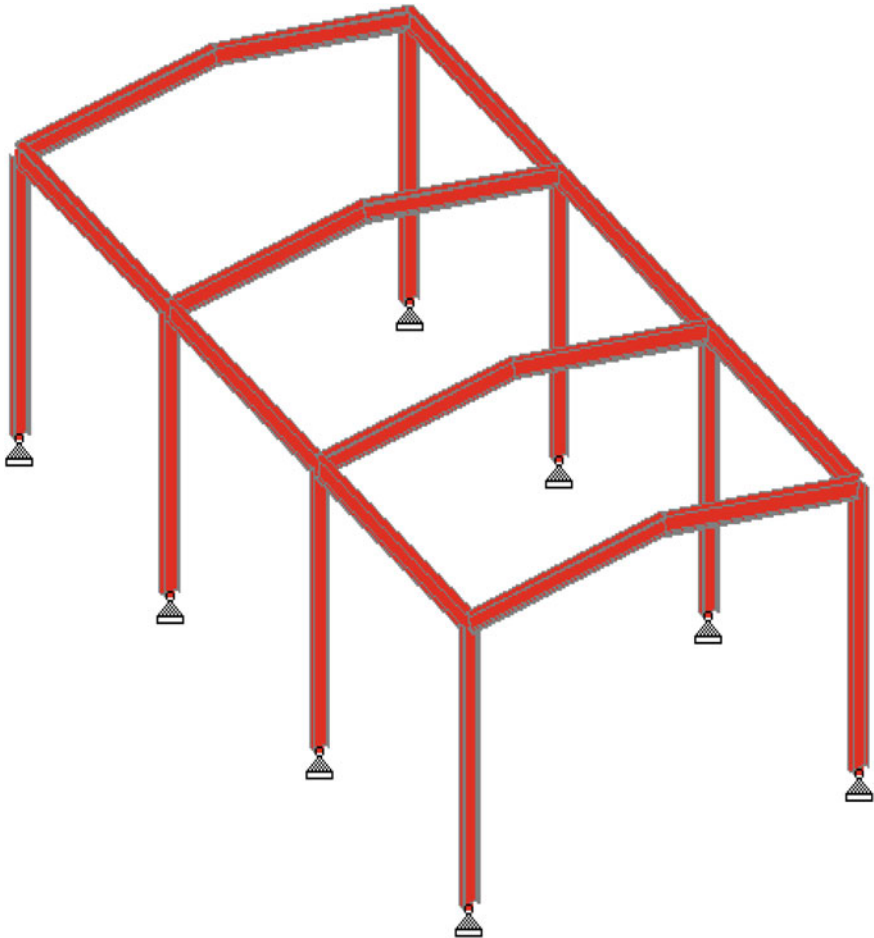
Typical 3-D frame consisting of hot-rolled I-sections
